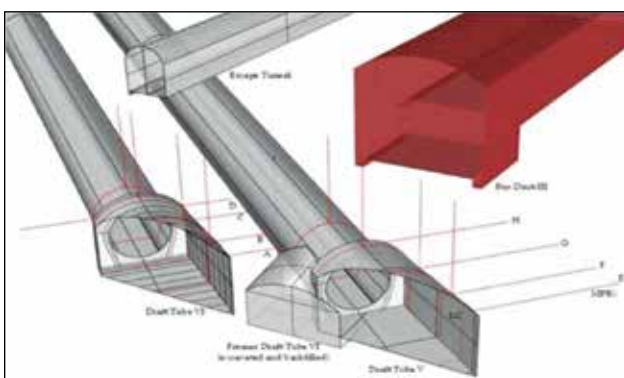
Layout showing installation locations for DT V and DT VI
